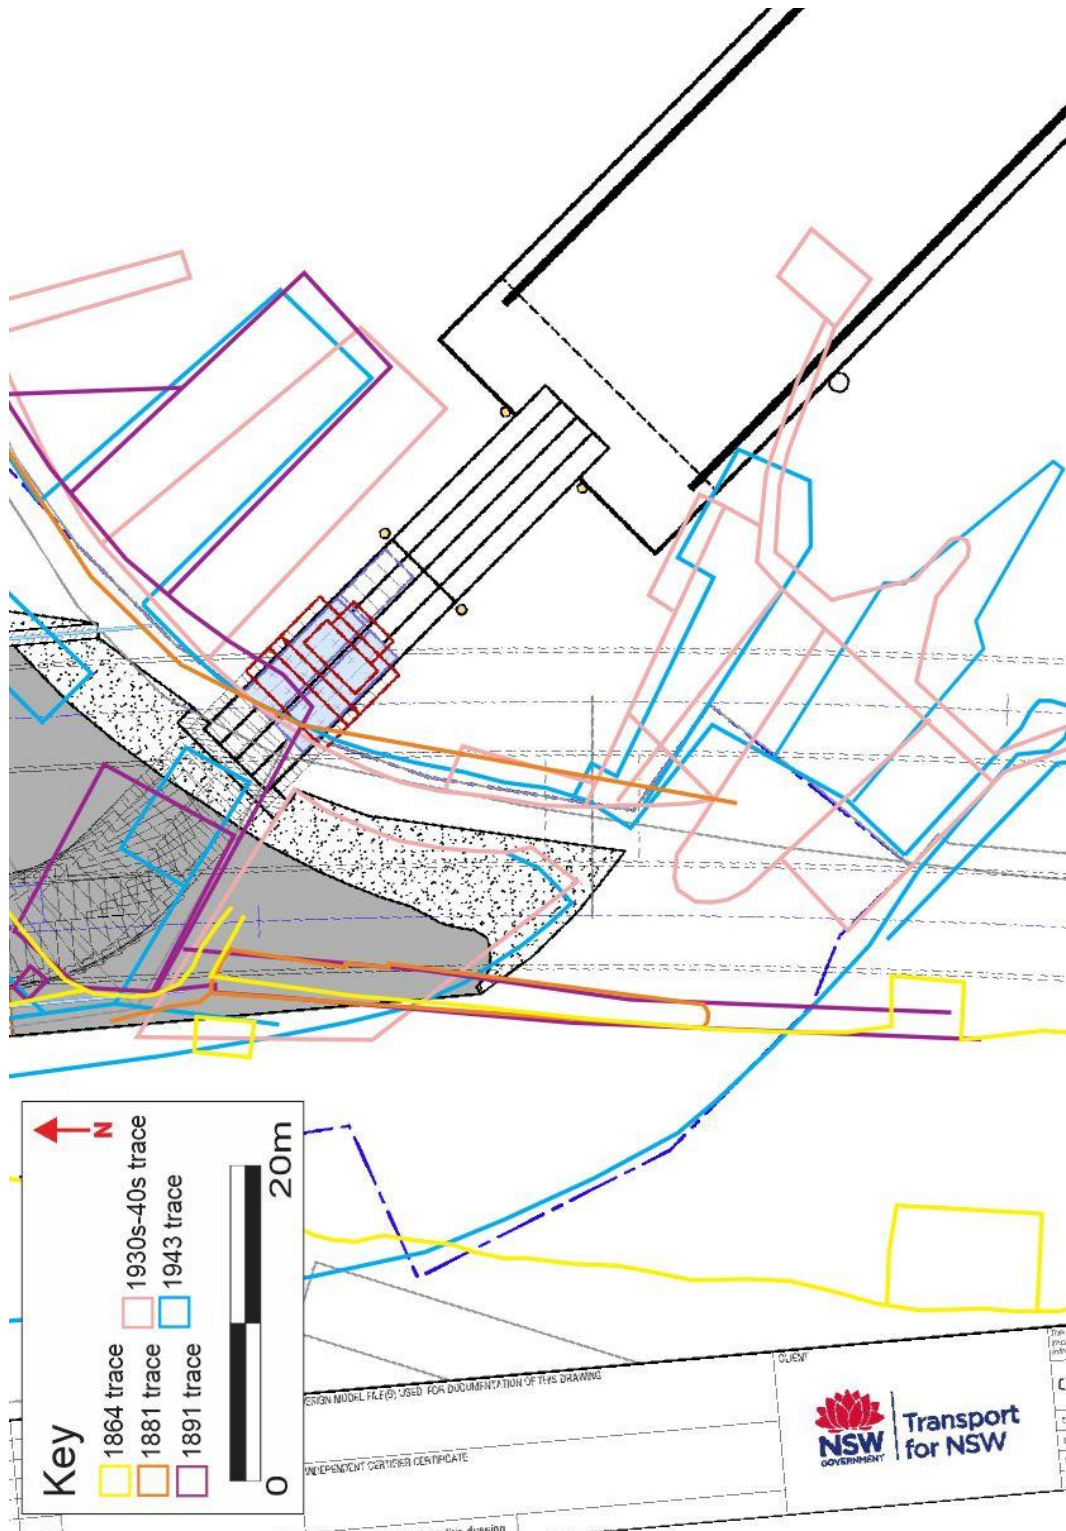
Outlines of historic structures in relation to the indicative proposed barge and ramp. Sydney Metro City & Southwest, Blues Point Site, Site Layout Overall Plan, 20/11/2017, Sheet 08, 16-001, R07, annotations by C&L. [To be updated when new design is available]
